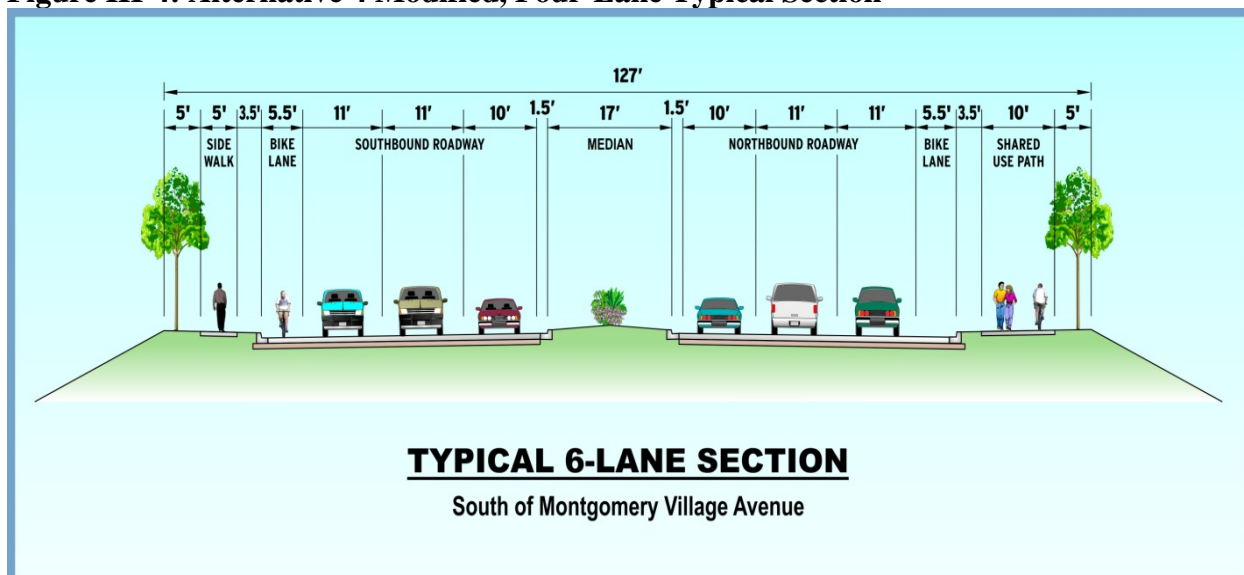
Alternative 4 Modified Six-Lane Typical Section
